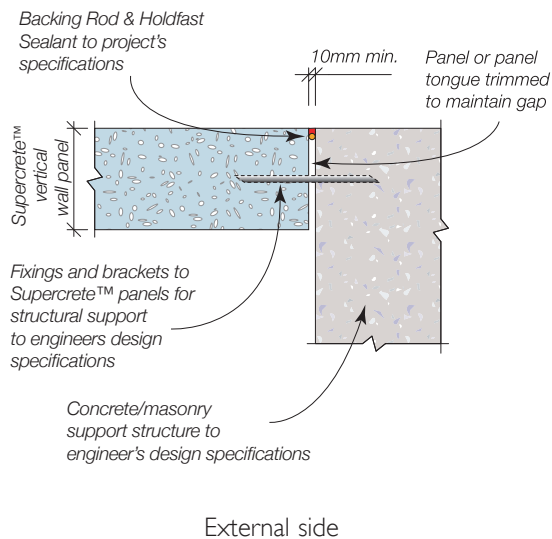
Vertical wall panel & concrete structure mid wall height junction detail.
